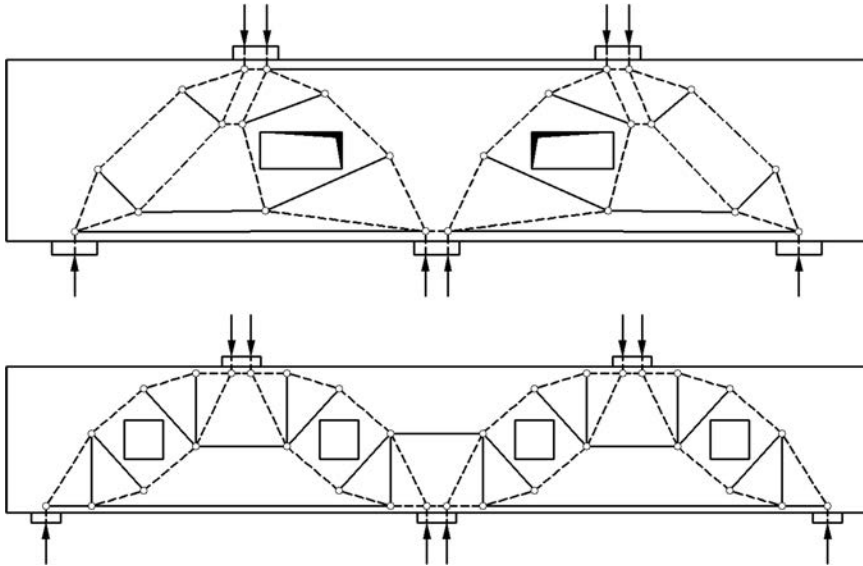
Examples on modeling of continuous deep beam with large openings utilizing inclined web reinforcement.
